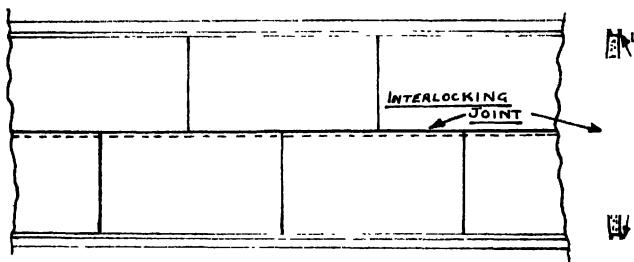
STAGGERED BAY (LONGITUDINAL INTERLOCKING CENTRAL JOINT TYPE)
